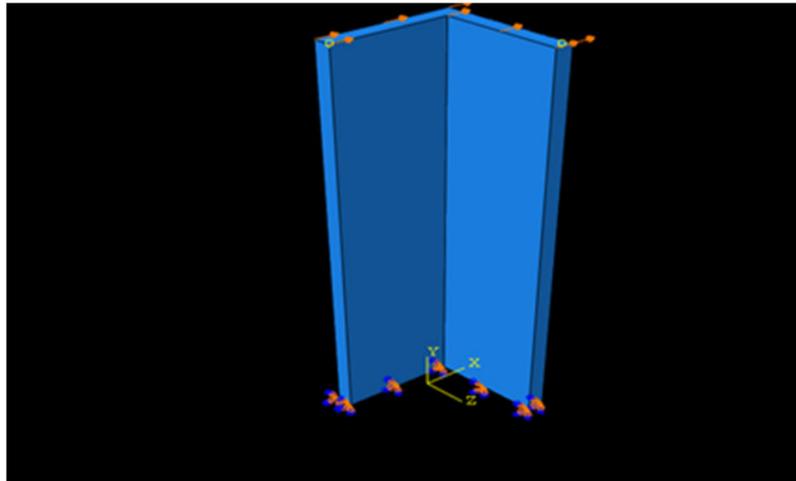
Loading and Restraint Assignment in L-shaped Wall
